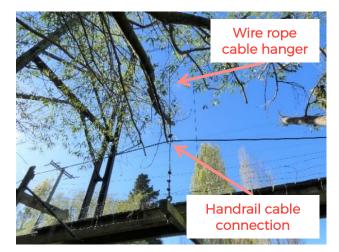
Typical wire rope cable hanger with handrail cable connection
